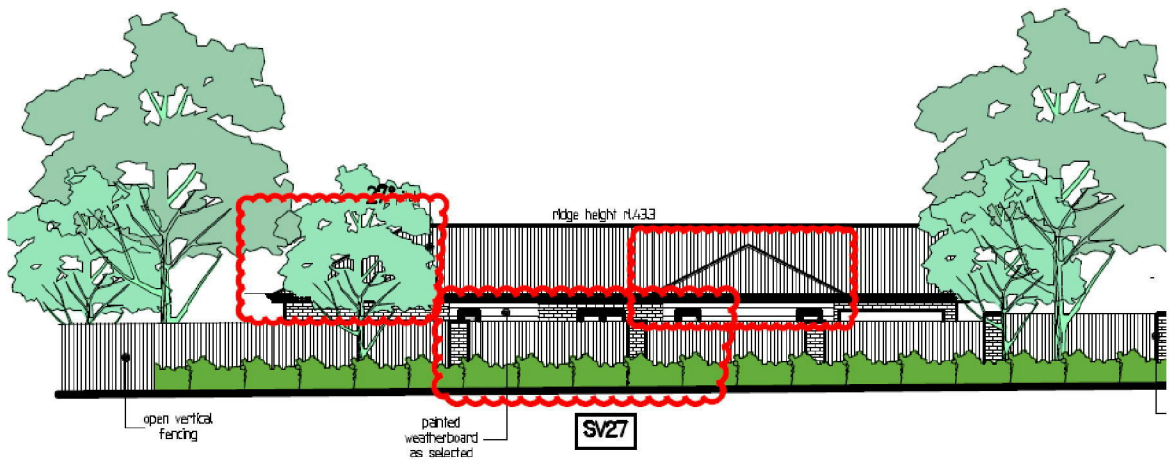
Proposed extract from Sheet 8 elevation demonstrating proposed maximum RL for Villa SV27 (Source: Lendlease Retirement Living)
